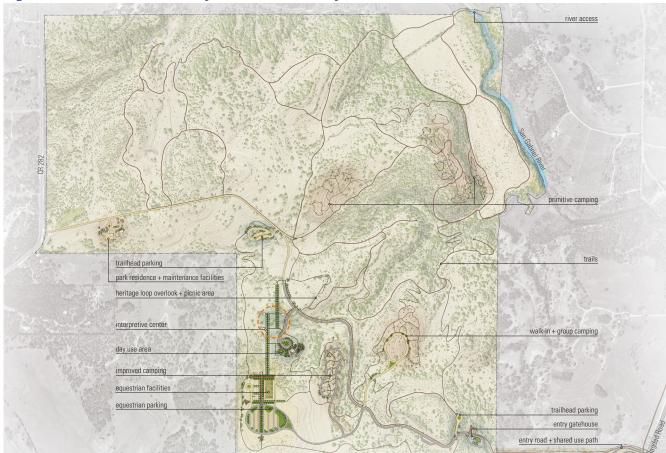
, River Ranch County Park - Preliminary Site Plan
